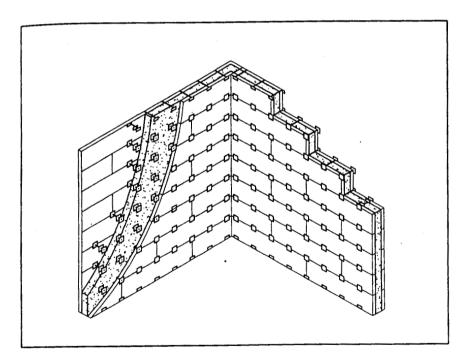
Cutaway View of a Wall Created with a Flat Plank System
